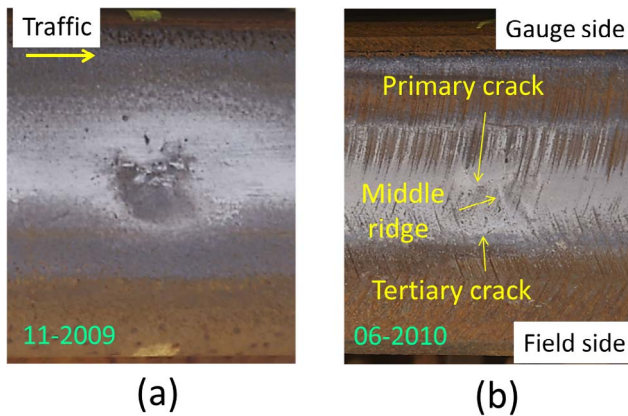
A squat with two cracks, i.e., a primary crack and a tertiary crack: (a) Before rail grinding; (b) after rail grinding to a depth of 1.1 mm.
